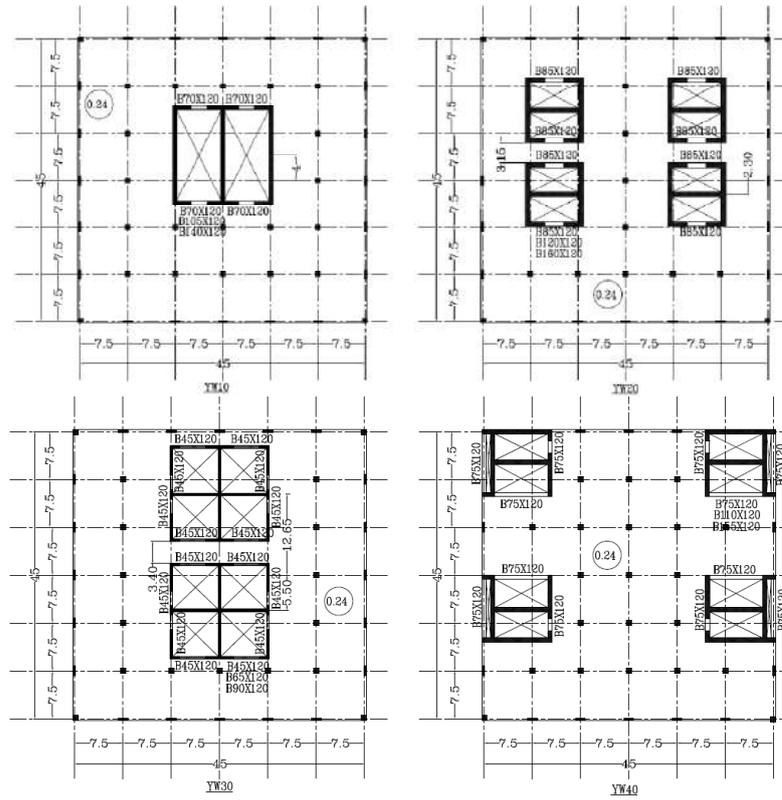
(Cont.) Structural Systems used in Core (Shear Wall) Case.
